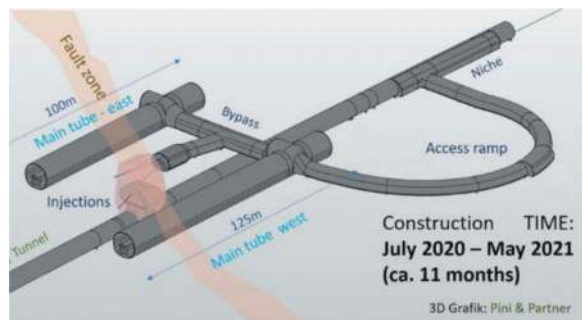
Ramp to the main tunnel level and excavation through the fault zone.
